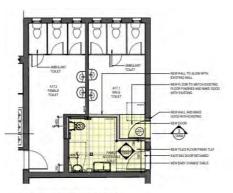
Station Services Equipment Room demolition and proposed plan (SSER) (Architectus, drawings dated 19/1/2024)
